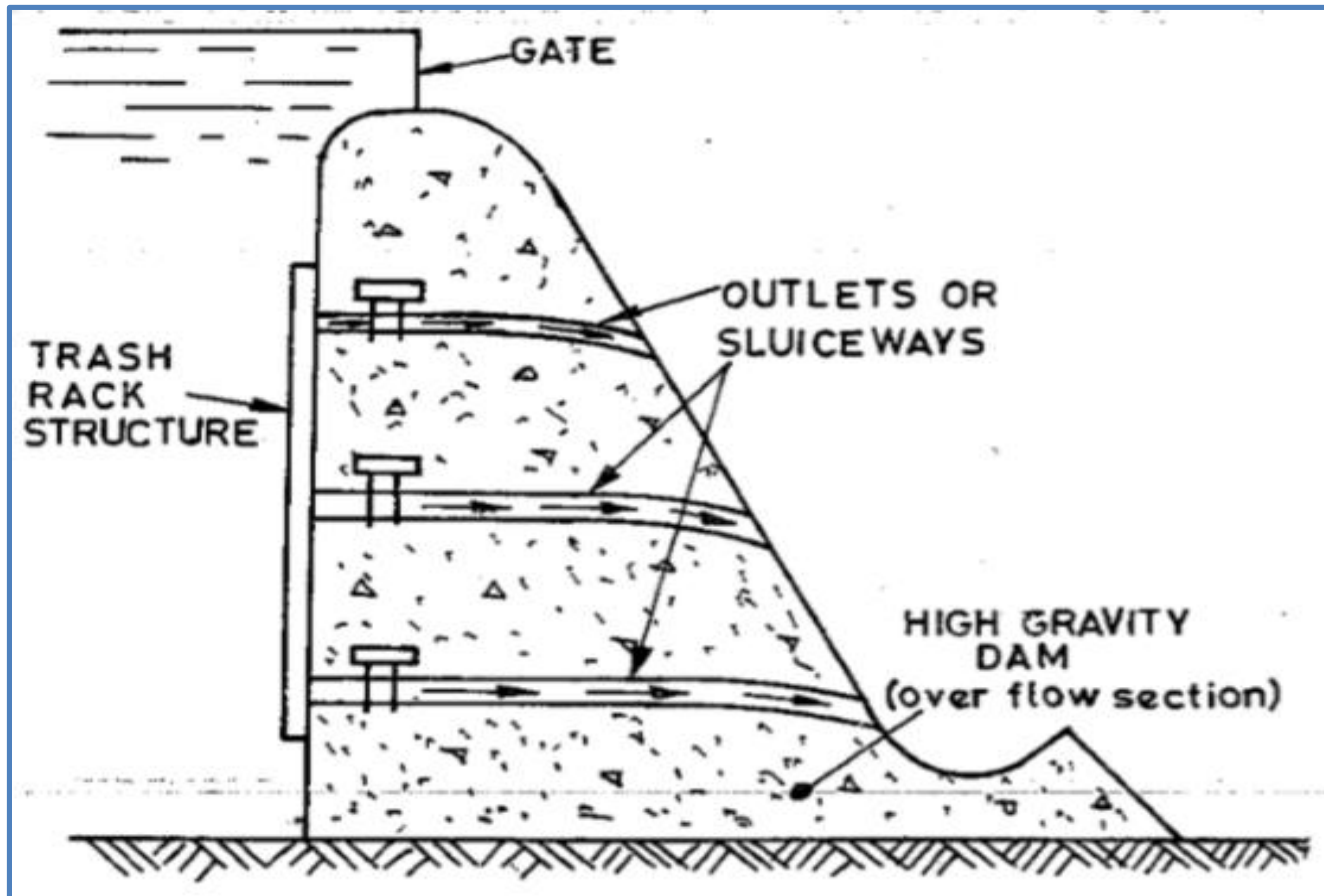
Typical outlet arrangements through a concrete gravity dam
